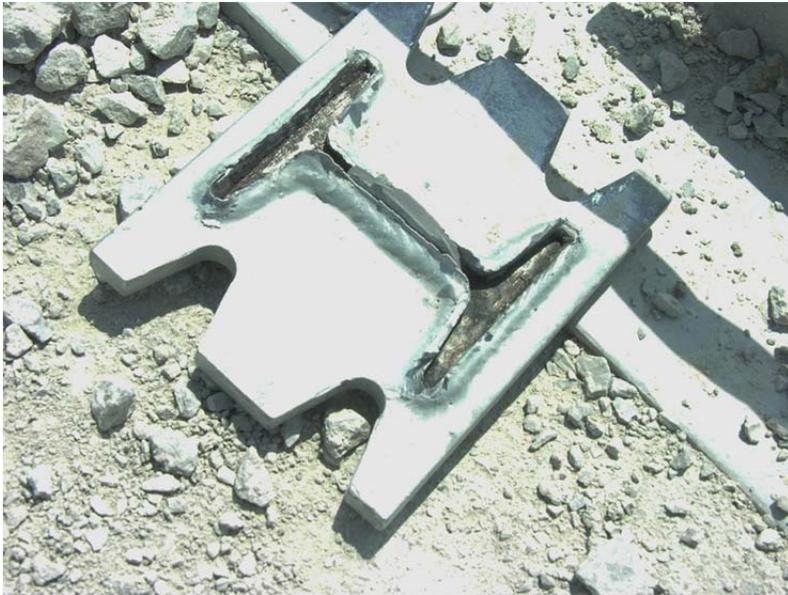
System Damage: Upstream Anchor and Post No. 1, Test No. NYCC-1
